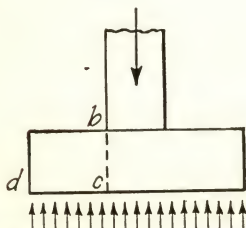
Transverse Stresses in Footing Determining Its Thickness
